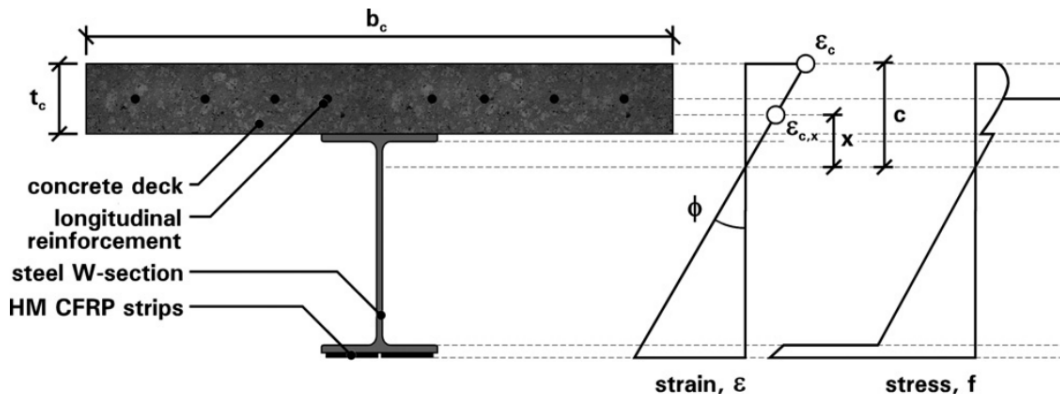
Strain and stress variations for steel to concrete composite beam section reinforced with HM CFRP layers
